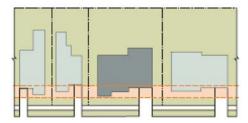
street setbacks located within a range defined by existing building setbacks.
